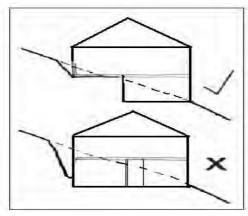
Habitable rooms are to have at least one external wall fully above existing ground level.
